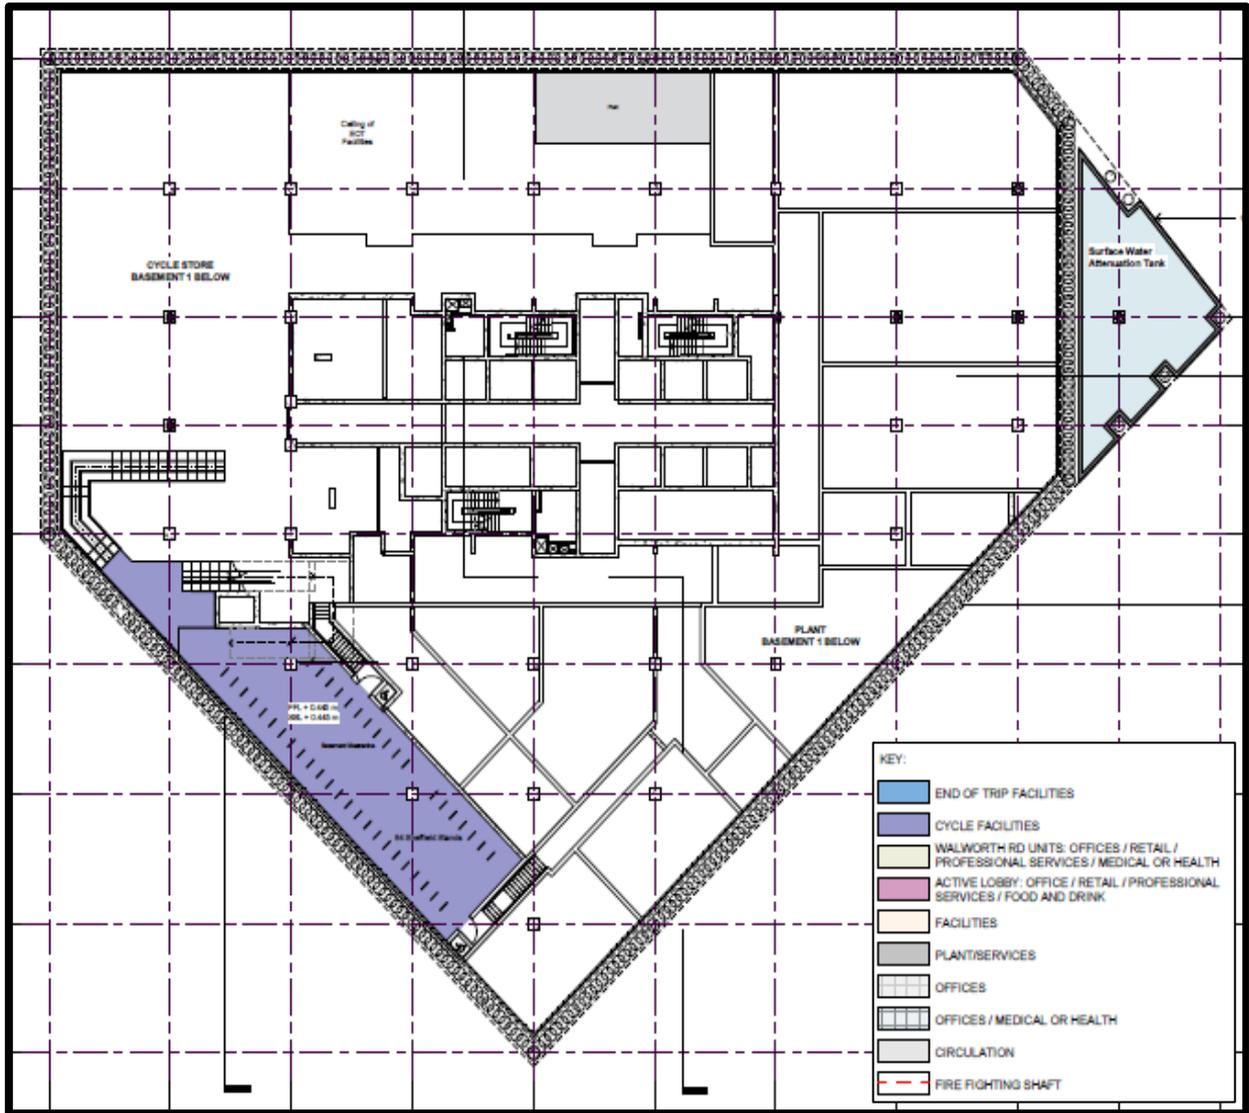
Sub-Basement Location and Layout (Basement Mezzanine) (Source: Modified from ACME)
